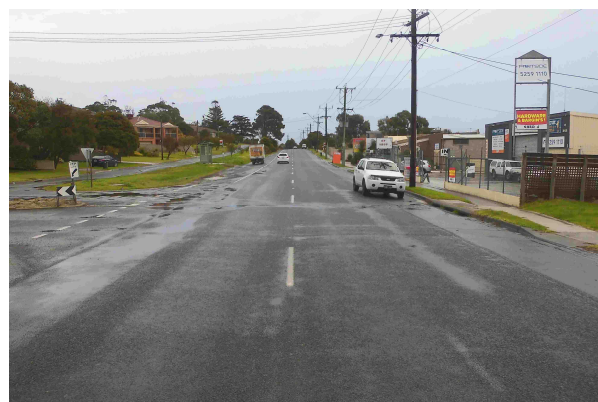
Looking west along Geelong Road. Subject site is at right of picture.
